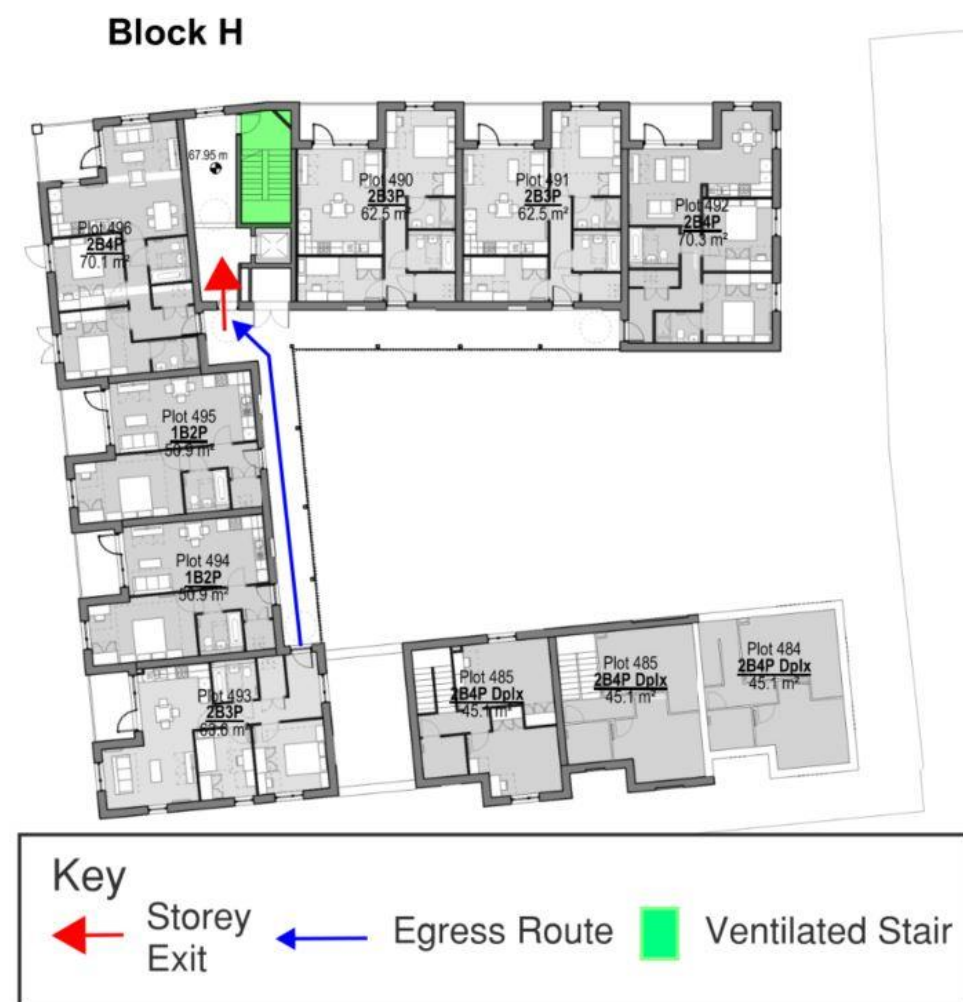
Typical layout means of escape via balcony approach - Upper level Block H
